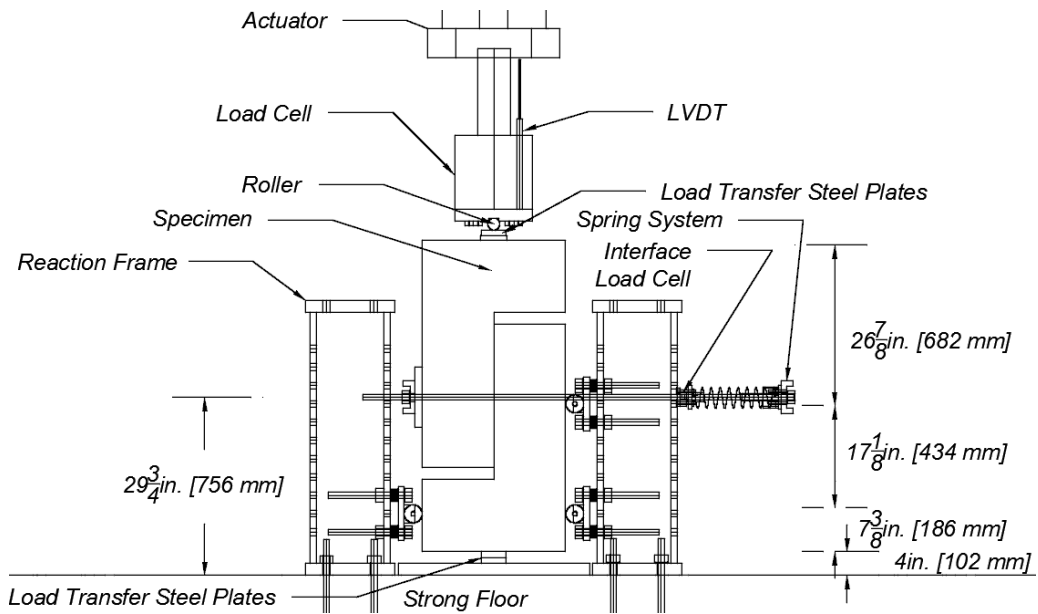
Side view elevation of the specimens containing #5 (#16M) reinforcing bars across the interface
